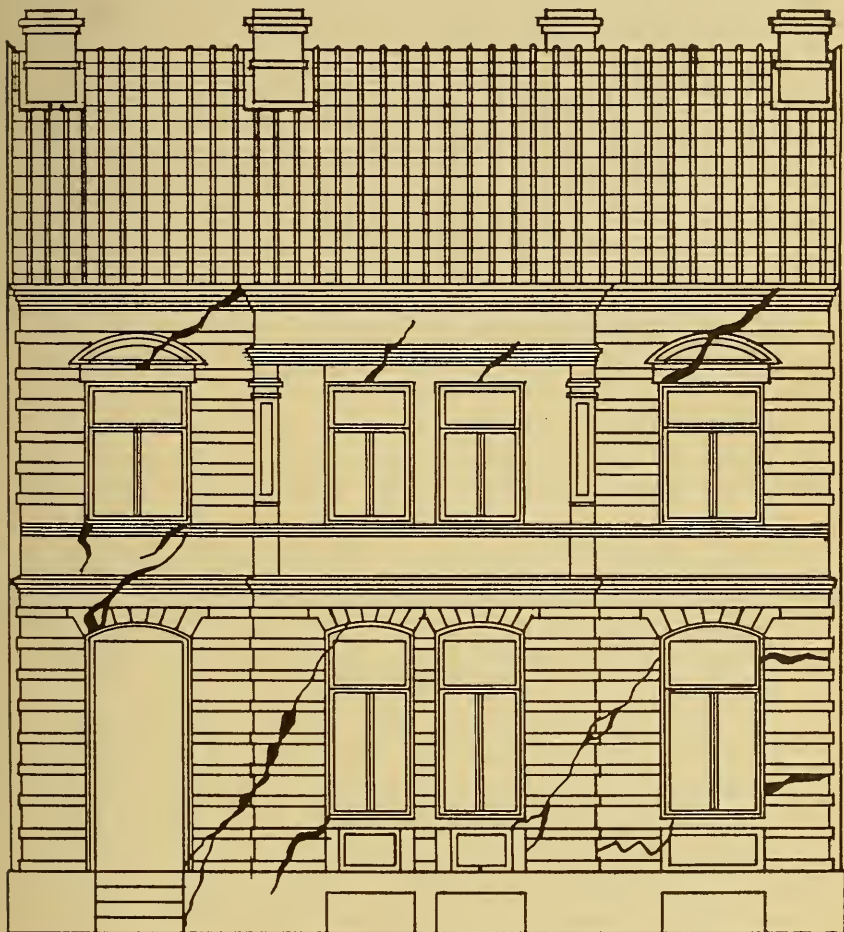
CRACKS IN MASONRY WALL.
